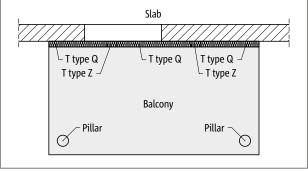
Schöck Isokorb® T type Z, K: Balcony with column support
